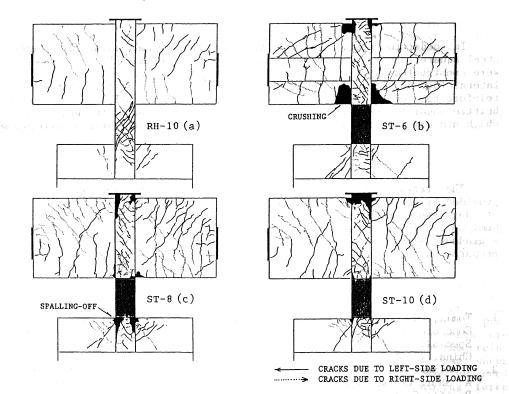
Cracking Patterns of Test Specimens after Test (1801)
